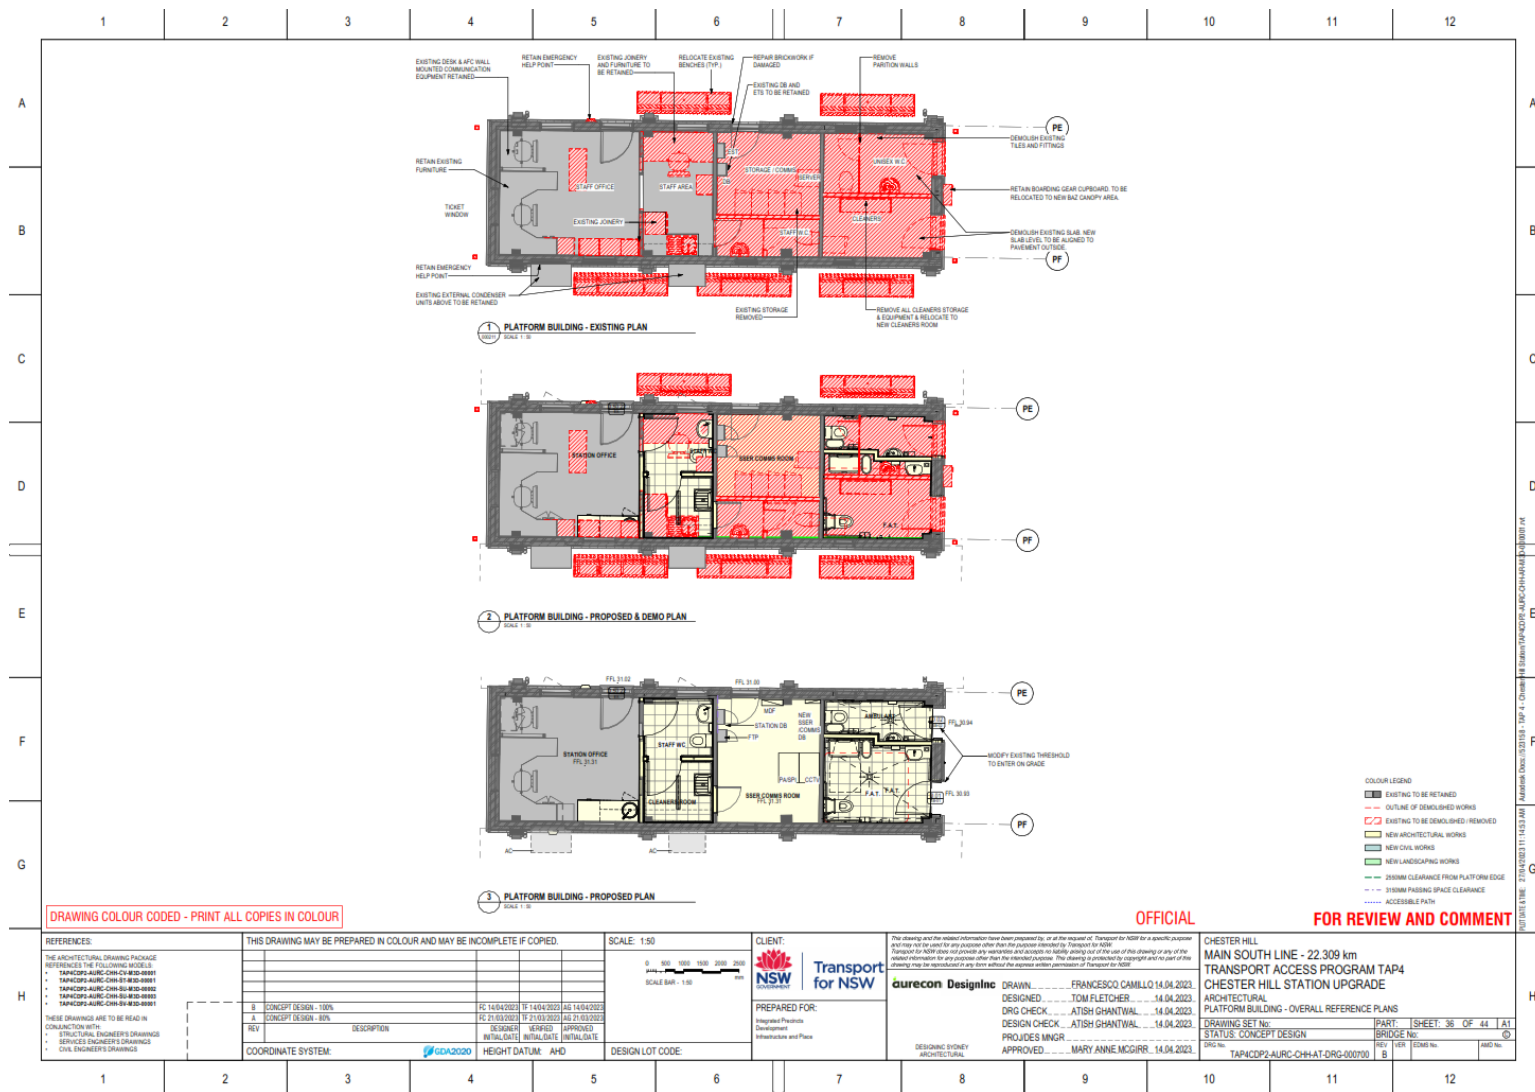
Platform building plan Chester Hill Station (Source: Aurecon 2024)
